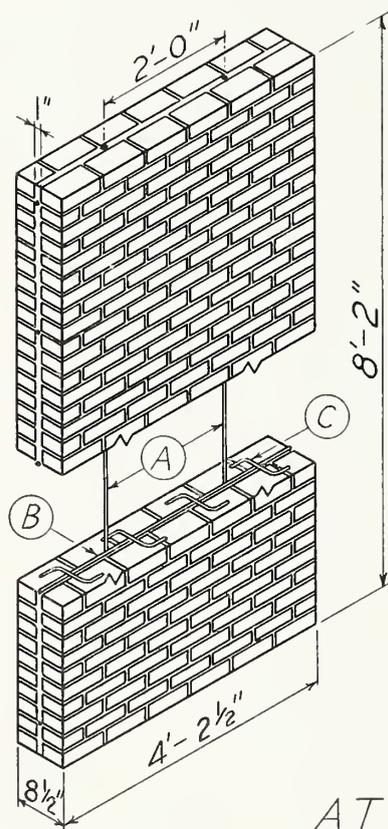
Four-foot wall specimen AT, having 35 courses.
